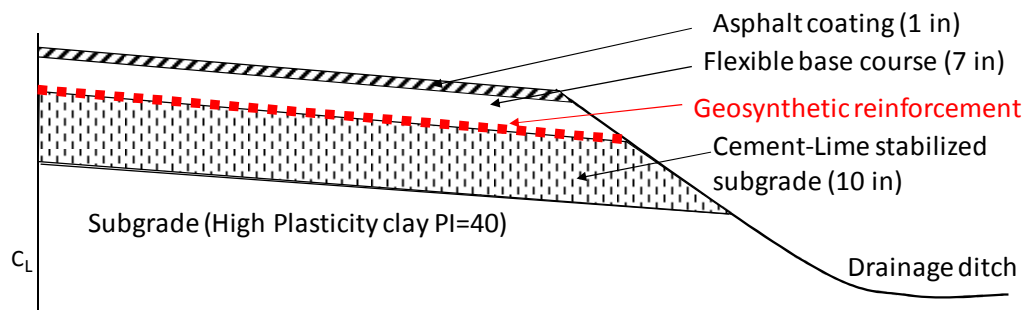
A typical geogrid reinforced pavement section at FM 1774
